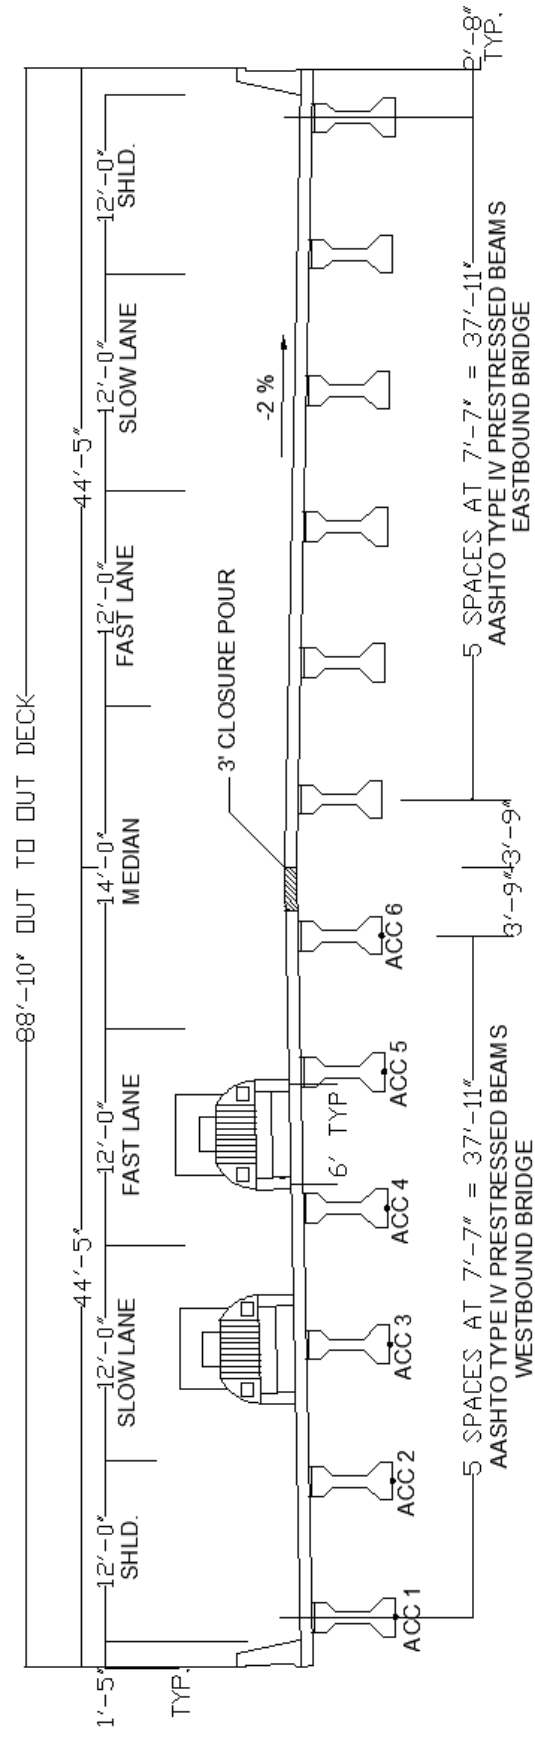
Elevation of Beaver Creek Bridge showing deck and girder
